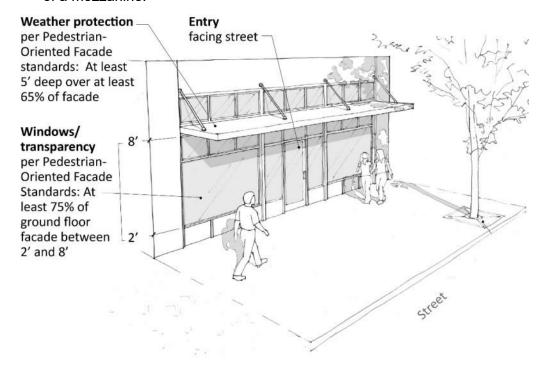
a. An example of a pedestrian-oriented façade.
